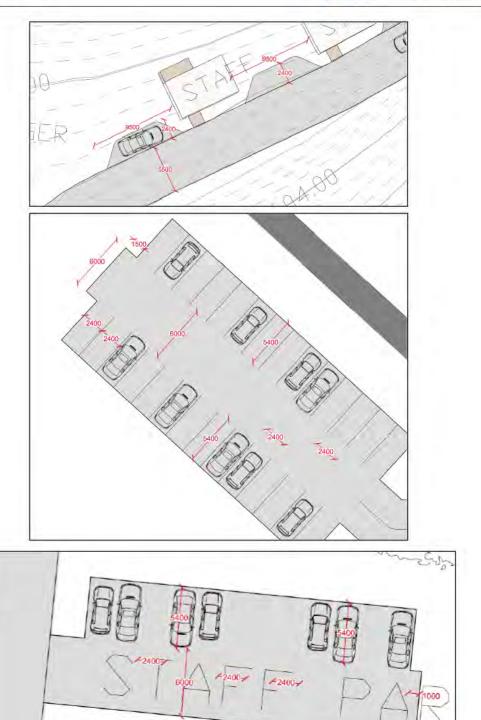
DIMENSIONED CAR PARKING PLANS
